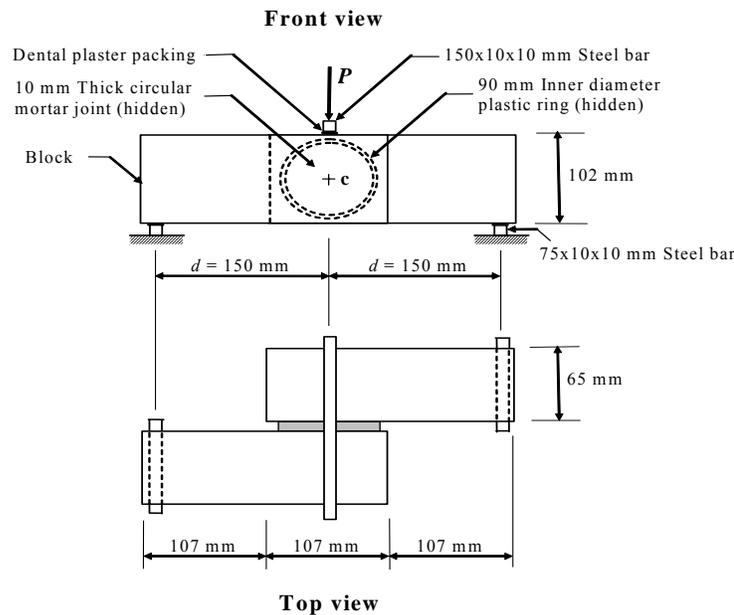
Load and Support Arrangements for Testing the Z-shaped Shear Specimens
